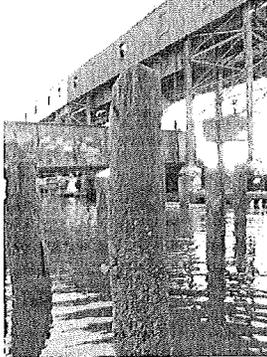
Pile D5, typical pile in fair condition showing top rot, looking northeast.
